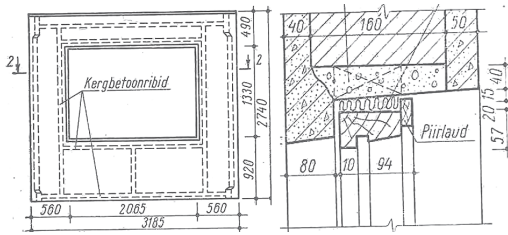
Original design drawings of reinforced concrete large-panel element building – external wall element (left) and external wall/ window junction (right)
